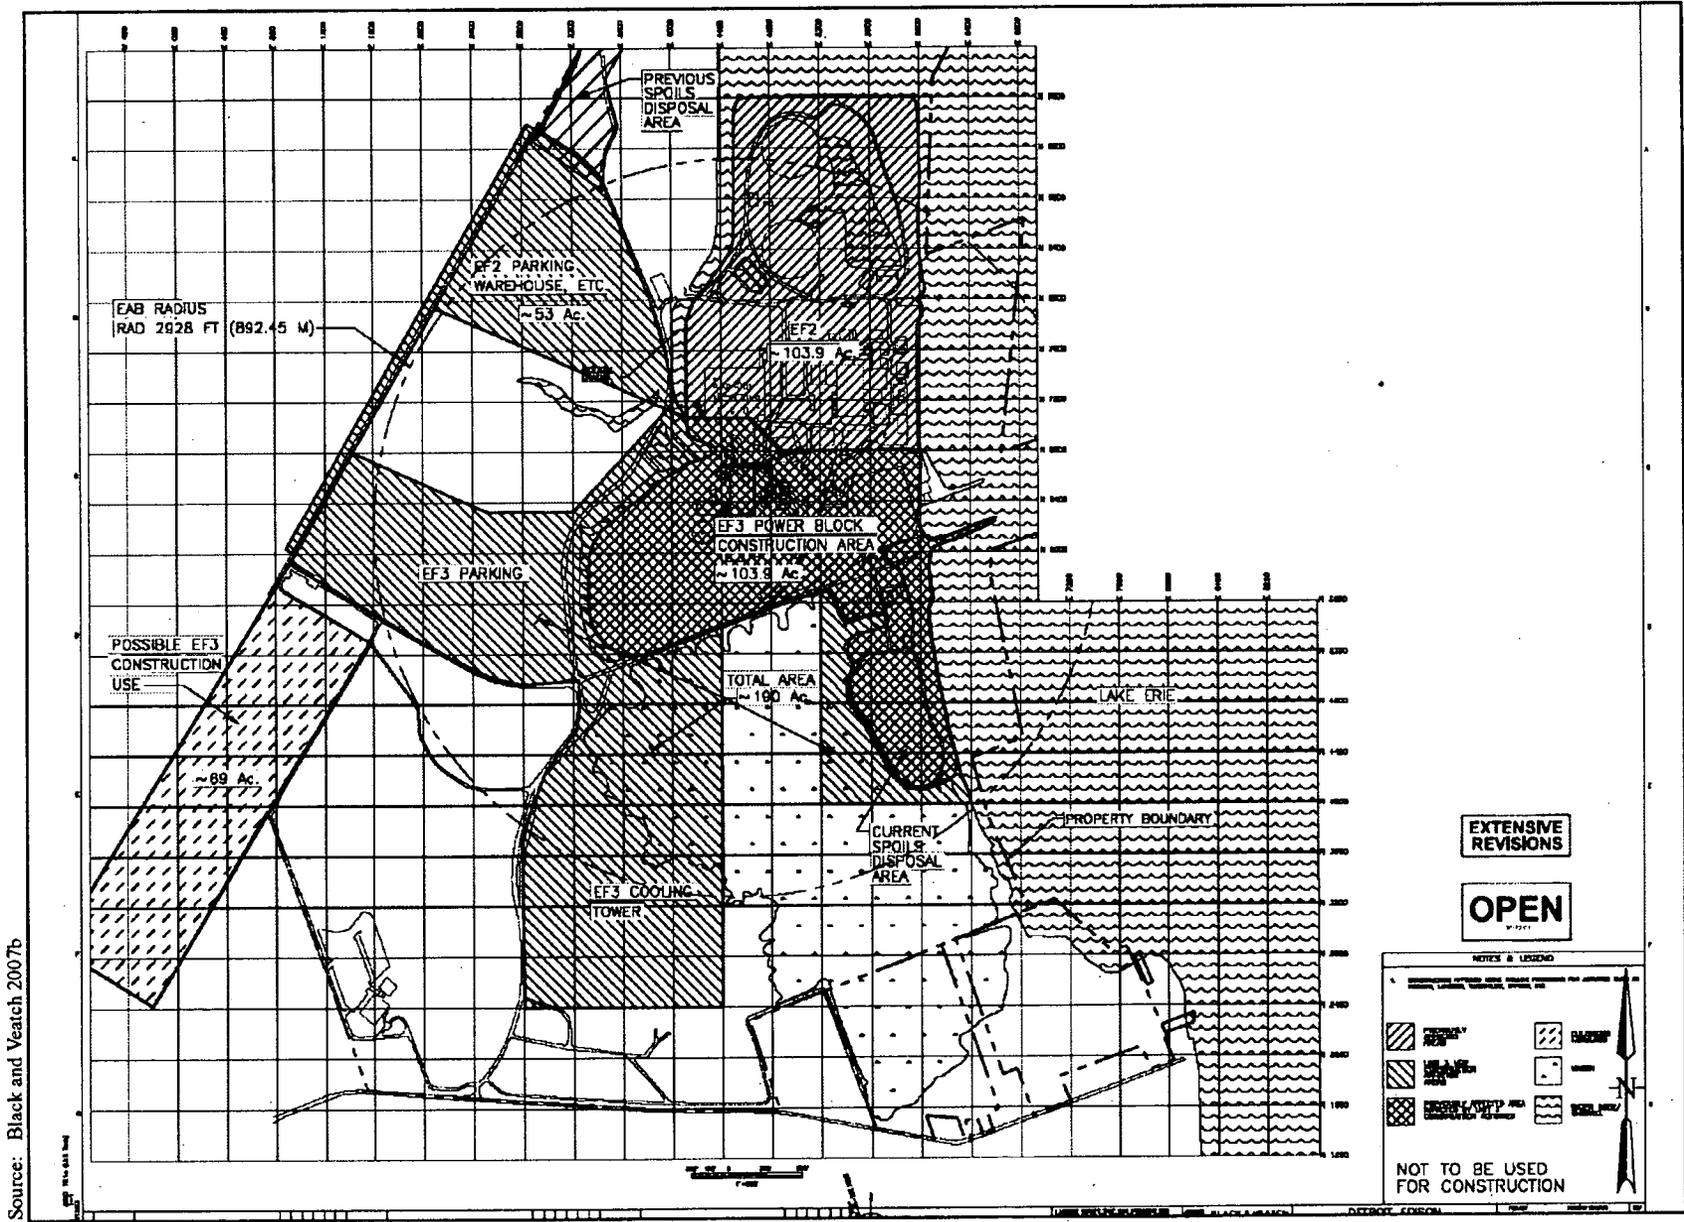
Fermi 3 Project Archaeological Survey, Revised Site Impact Plan
